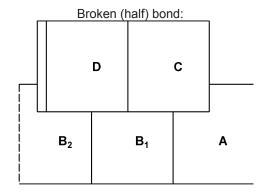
Arrangement of tiles (A, B, B₁, B₂, C, D are tiles)
